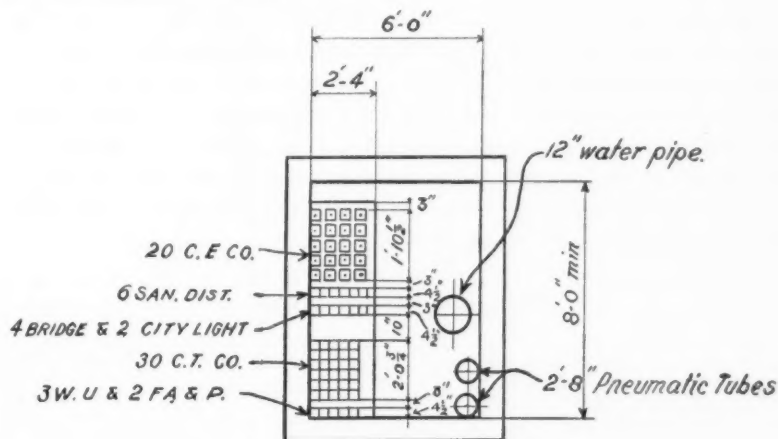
CROSS SECTION CHICAGO SUBWAY
